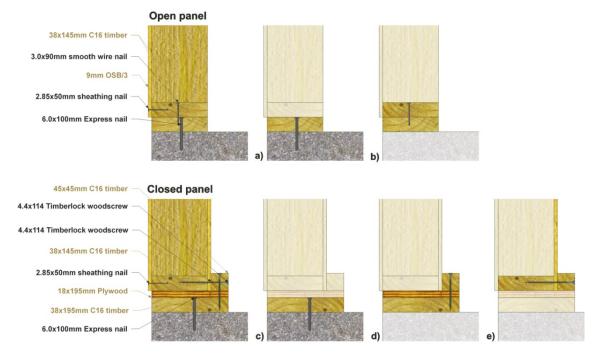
Detail of the two sole plate base fixings studied and their isolated connections.
